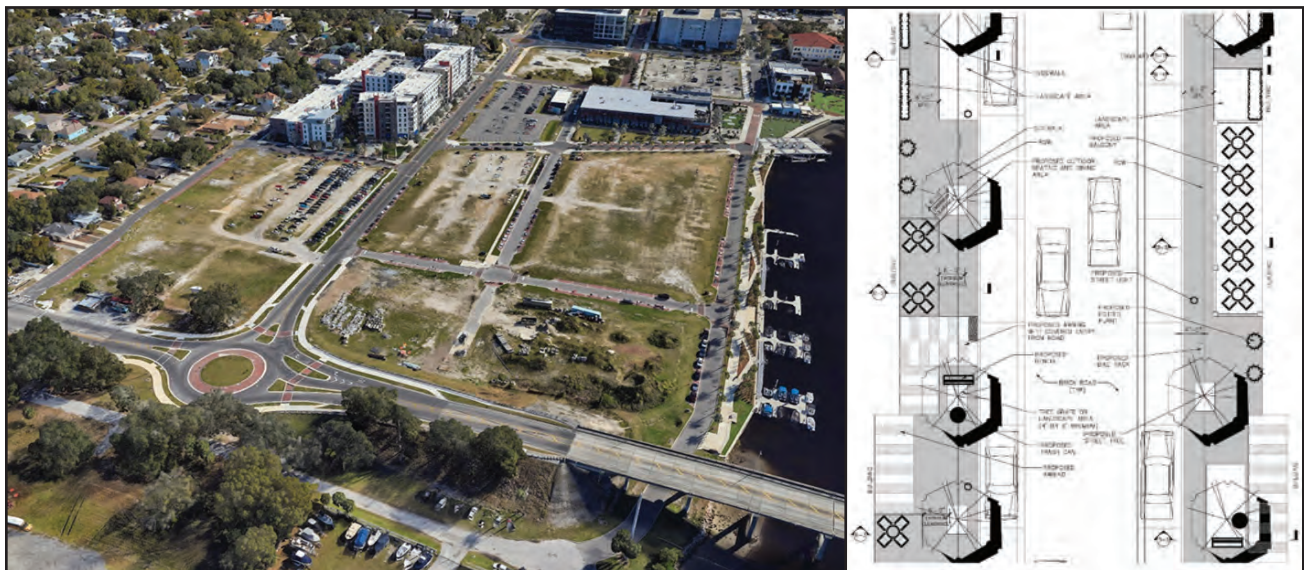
AERIAL VIEW OF NEW STREET ALIGNMENTS & RIGHT OF WAY ENHANCEMENTS
